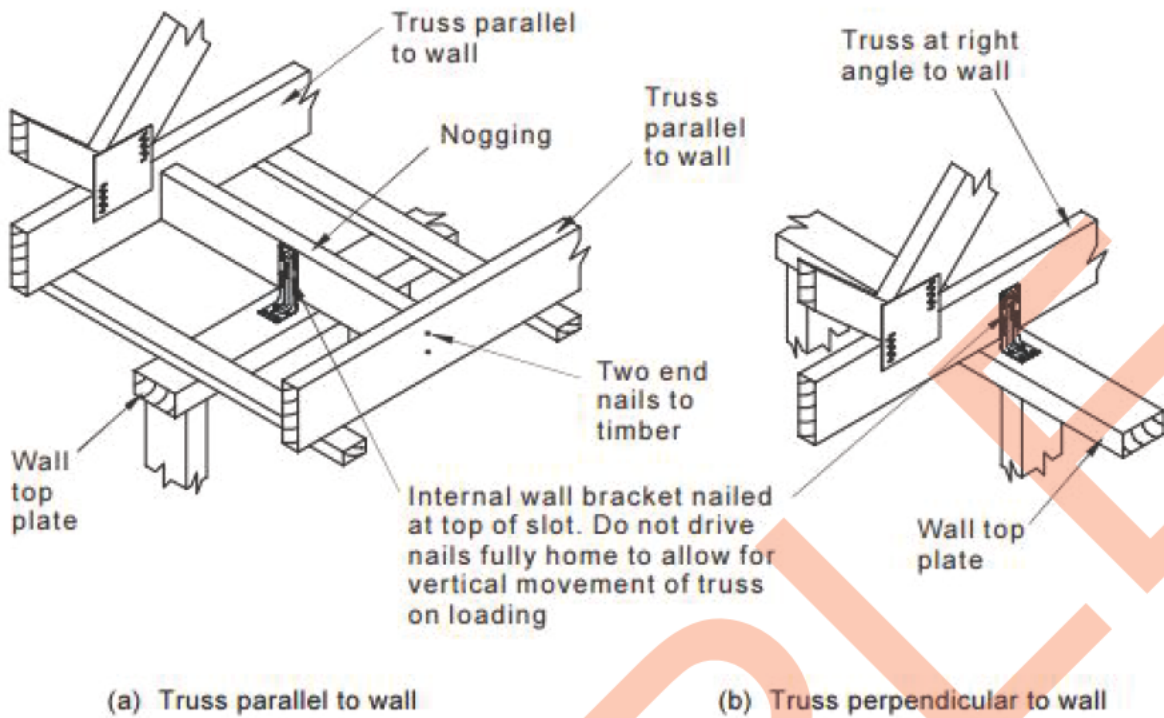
FIXING OF TRUSSES TO FREESTANDING NON-LOADBEARING WALL THAT IS NOT A BRACING WALL
